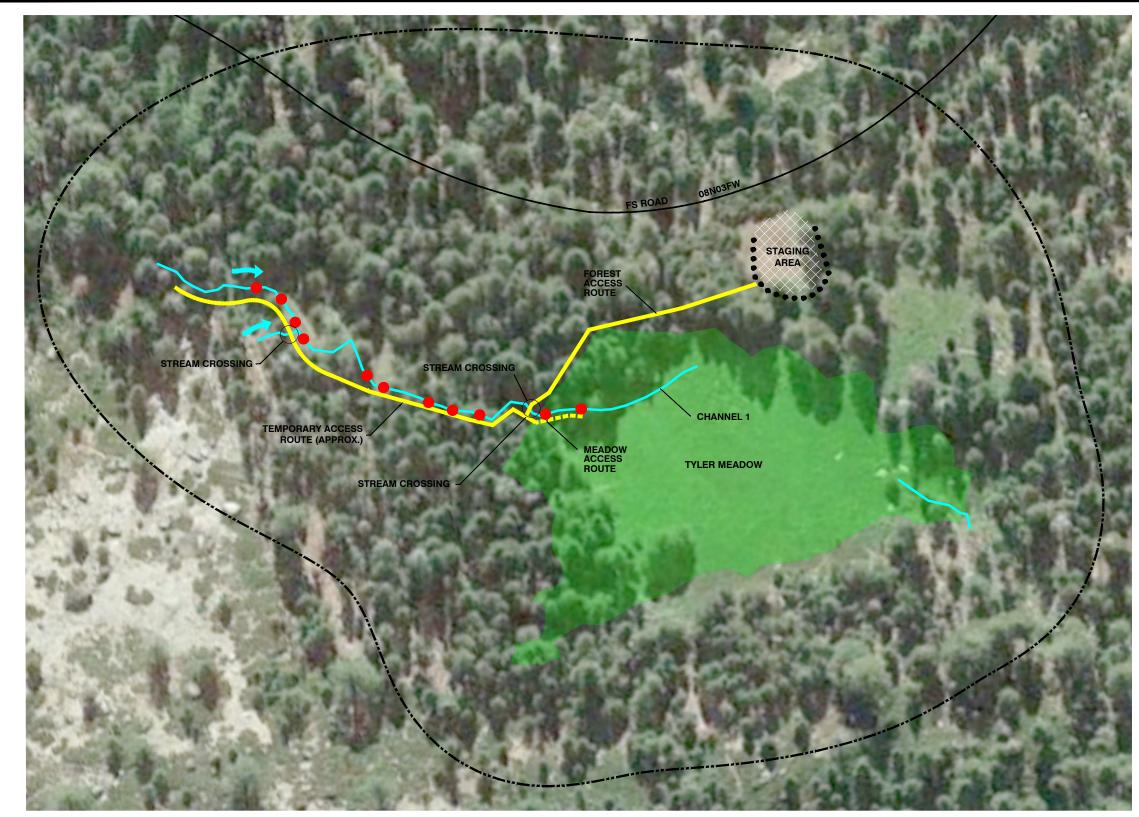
THREE MEADOWS RESTORATION PROJECT TYLER MEADOW PLAN VIEW
